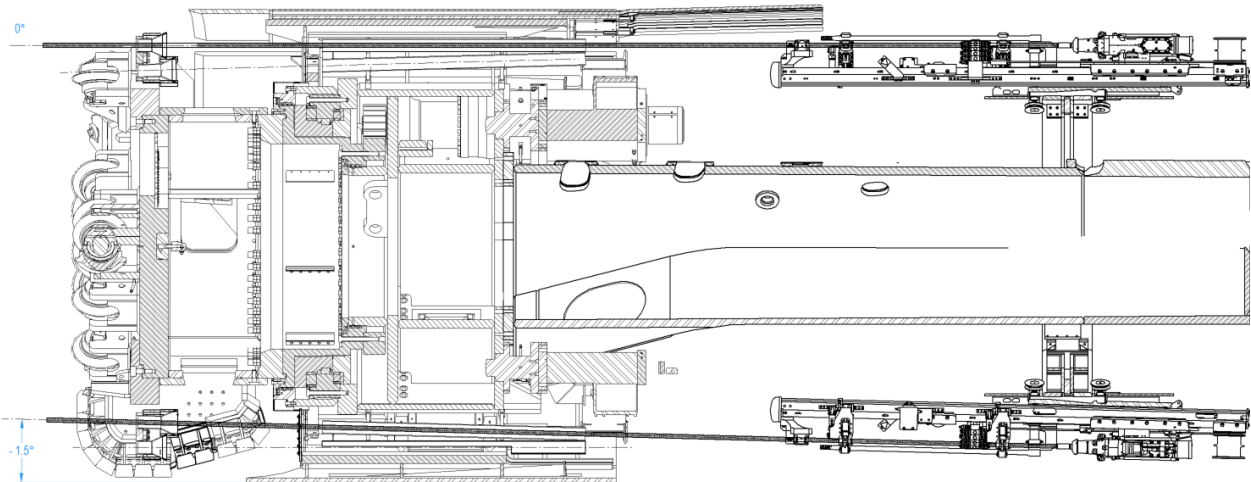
0° and -1.5° Probe Tilt Angles Through Cutterhead on JB2
